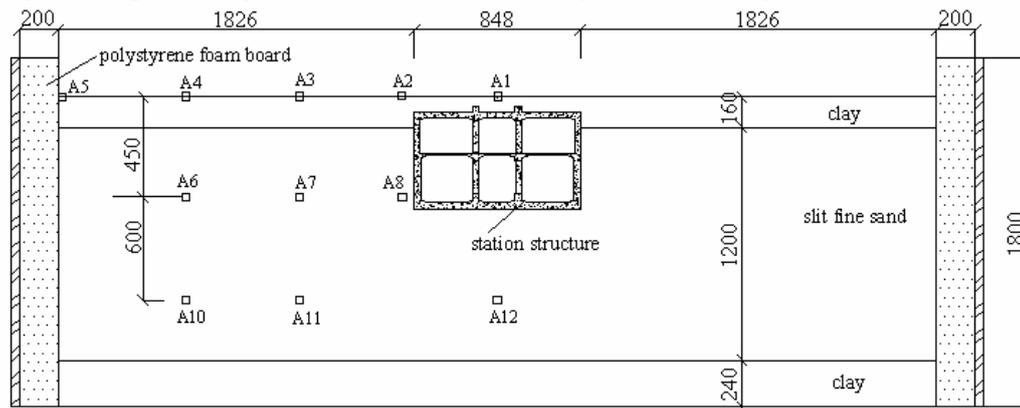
Schematic section of subway station structure and site model, arrangement of accelerometers (unit: mm)
